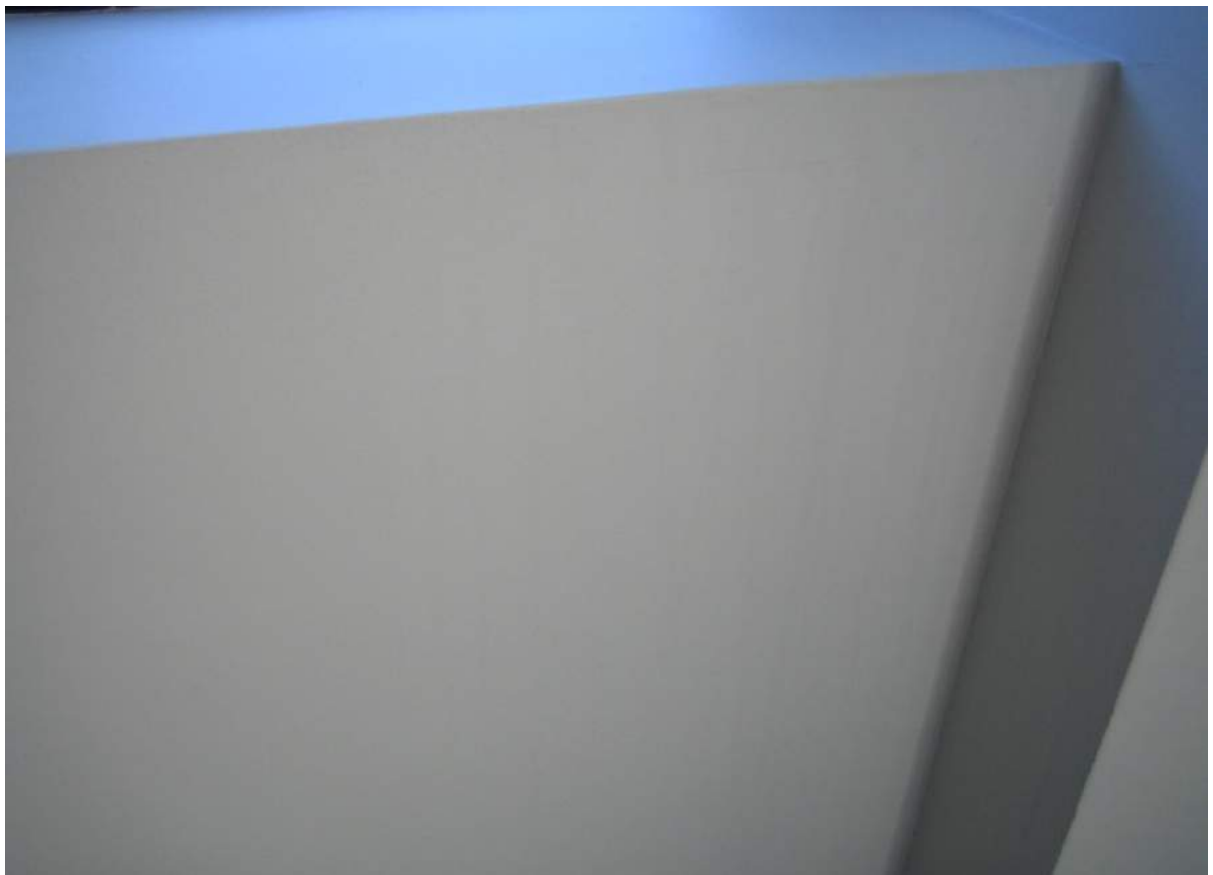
Water stain lines below the window in the N/E corner of bedroom 1 to Unit 205.
